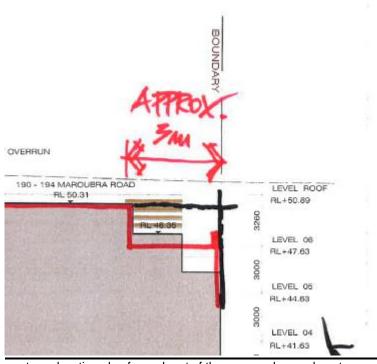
Indicative eastern elevation plan formed part of the proposed amendments as required by the JRPP
